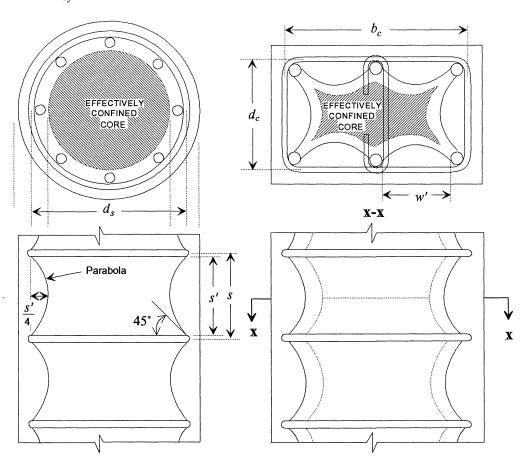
Confinement Mechanism for Circular and Rectangular Cross Sections
